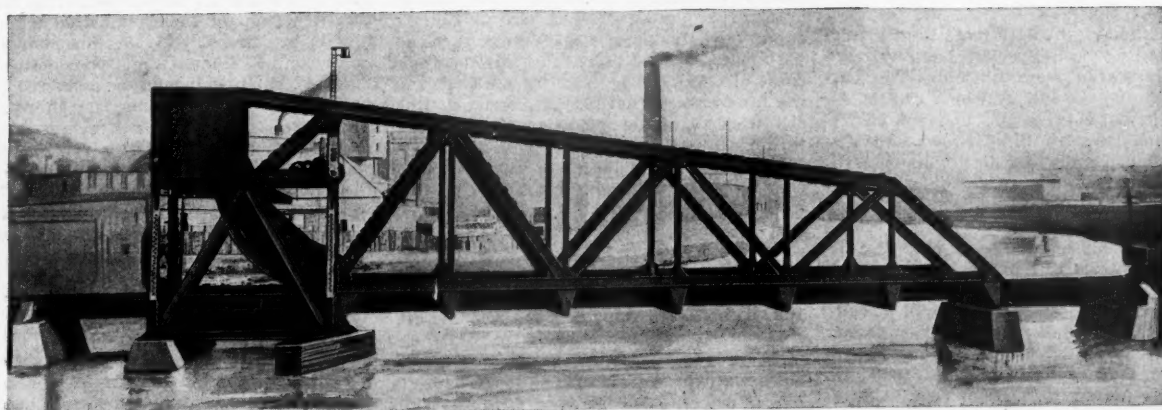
Scherzer Rolling Lift Bridge Closed, Newburgh & South Shore.
